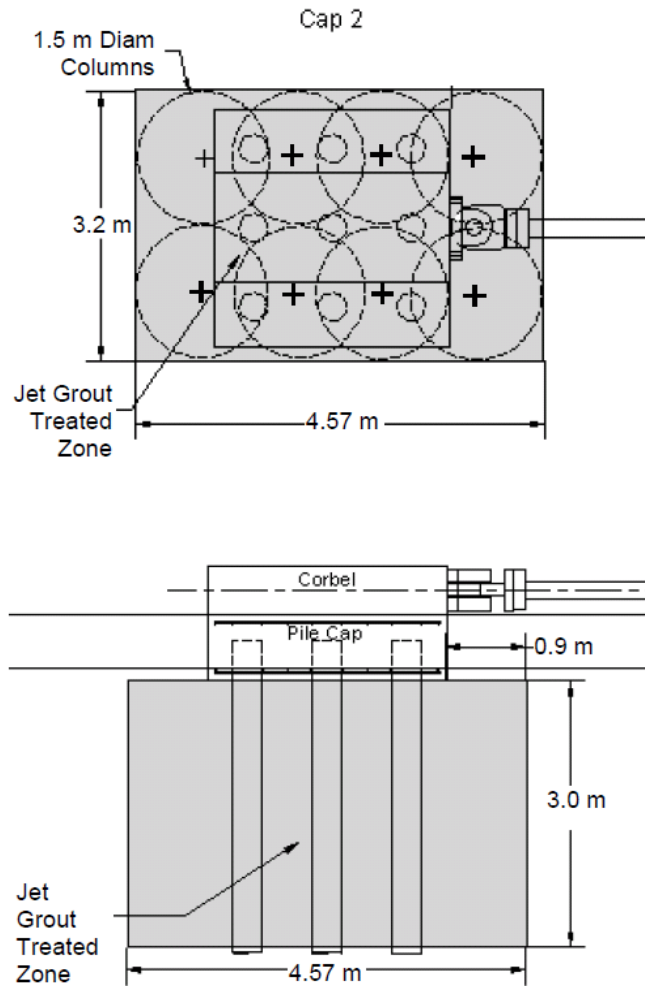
Plan and profile drawings of pile groups with jet grout treatment under the pile cap (Rollins et al., 2010)
